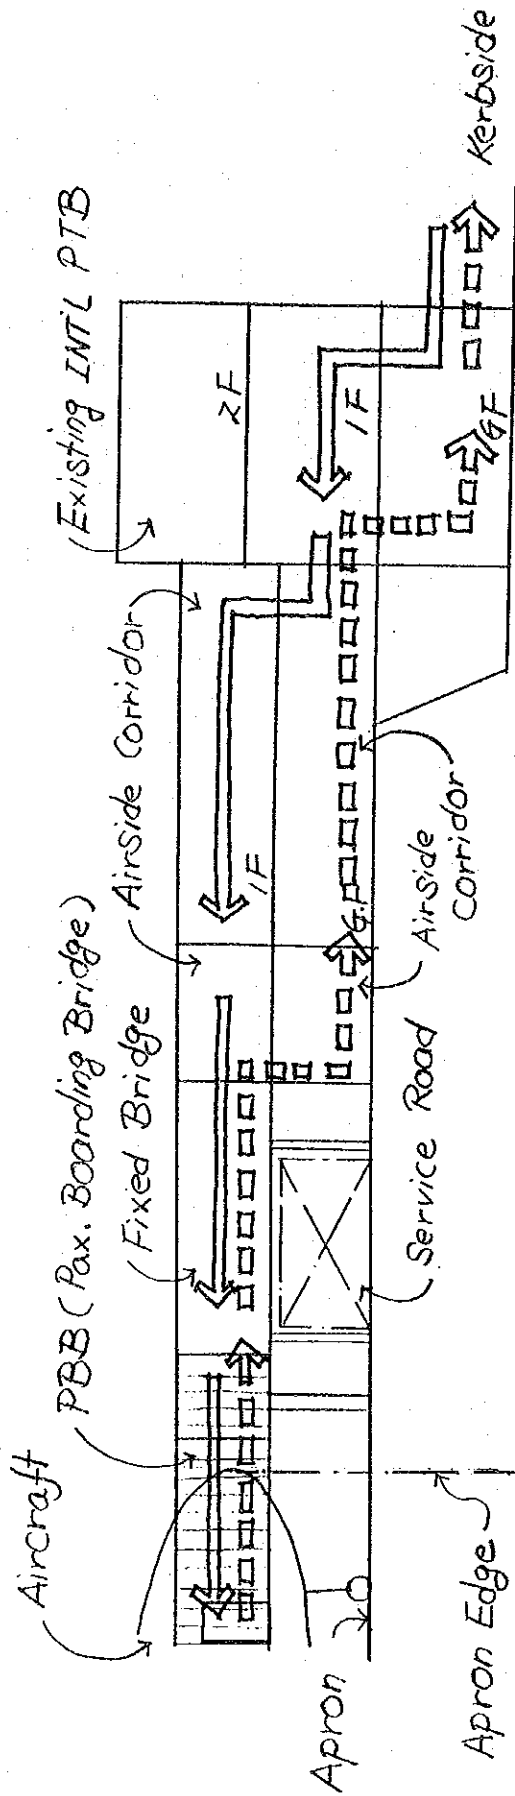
Departing and Arriving Passenger Flows, Floor Plan
